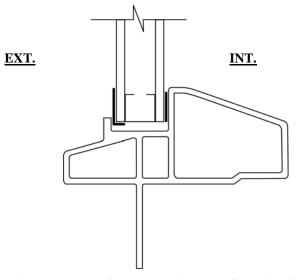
Vertical section through the fixed PVC window profile, with a finned window frame
